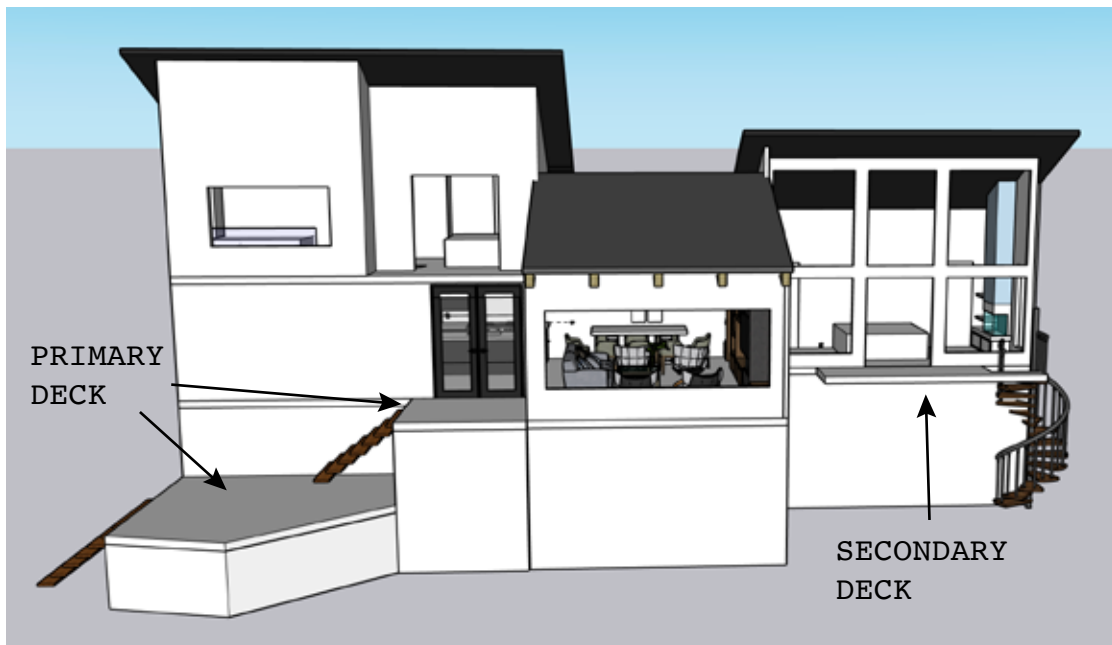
PHOTO OF EXISTING HOUSE AND DECK CONFIGURATION
